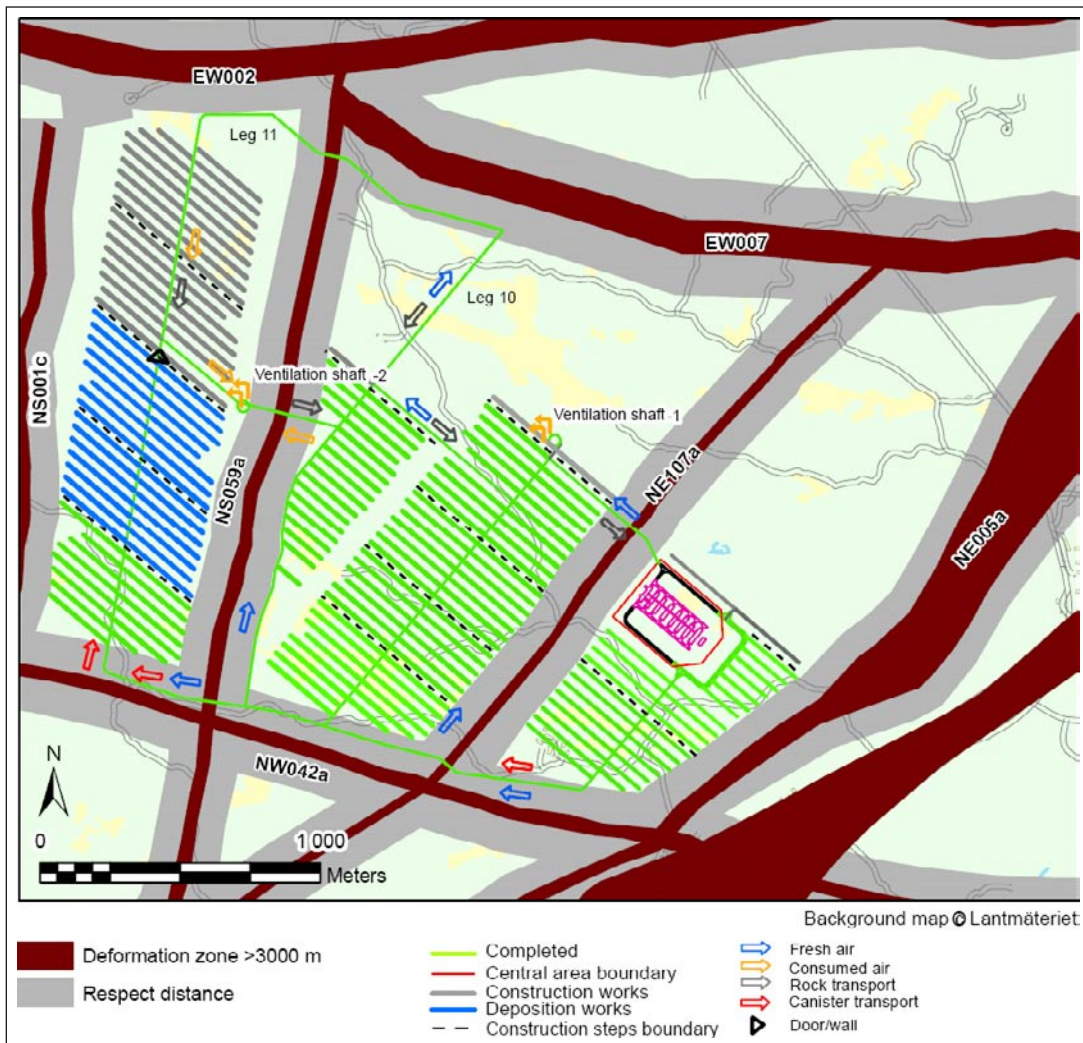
Excavation in leg 10 and 11 and excavation work in construction steps 11 and 12 and deposition works in construction step 9 and 10.
